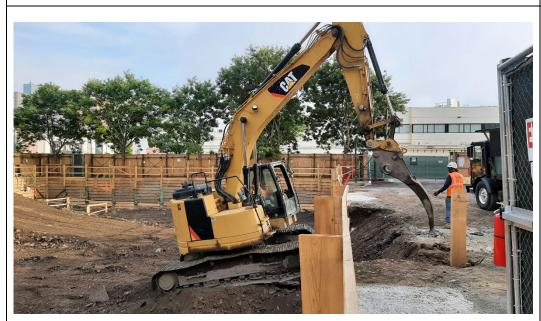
View facing N building footprint, excavator used to assist crew in setting up wooden railings across previous ramp entryway.
